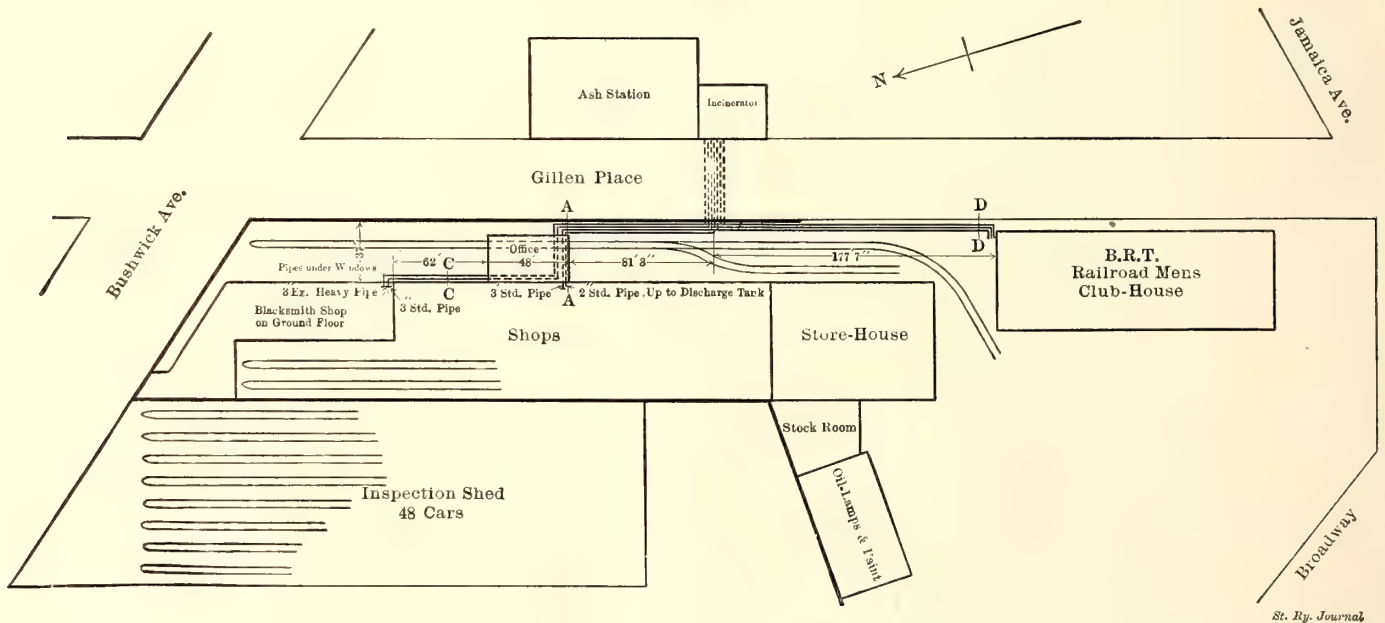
PLAN OF THE EAST NEW YORK SHOP AND YARD PLANT, SHOWING PARTIAL LAYOUT OF THE HEATING SYSTEM FROM THE INCINERATOR PLANT
